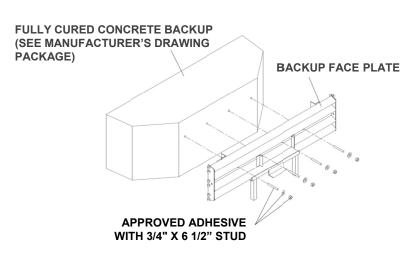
Anchoring Backup Face Plate to Concrete Backup
